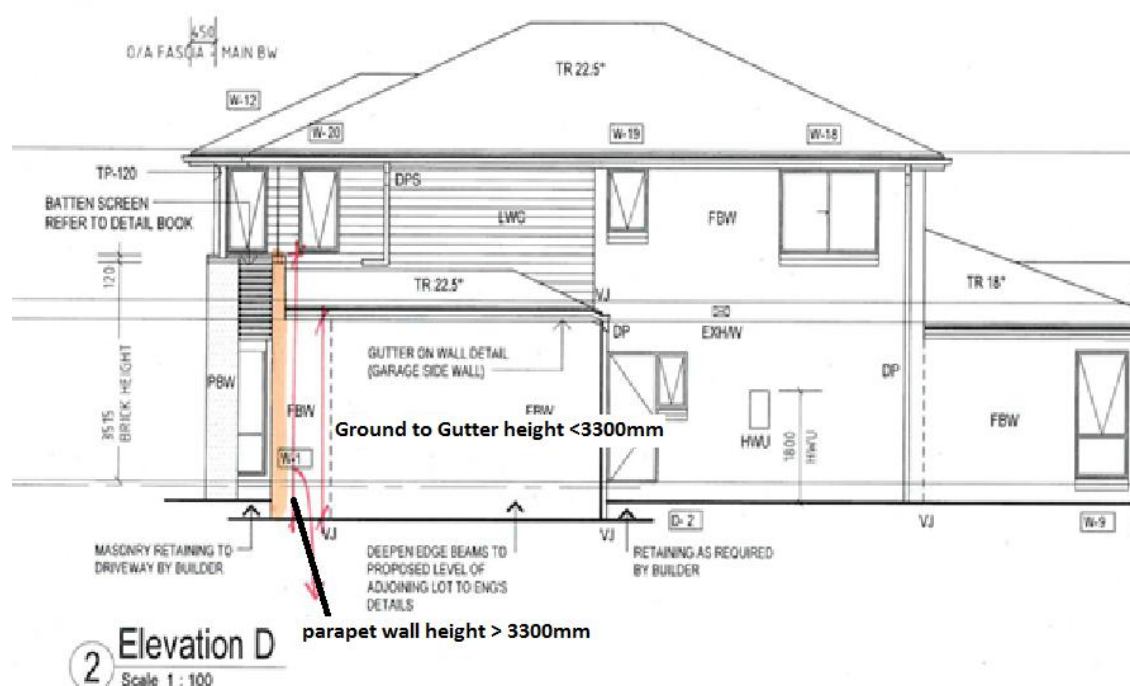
Example of contemporary design which include a parapet that exceeds the proposed 3.3m building height limit.
